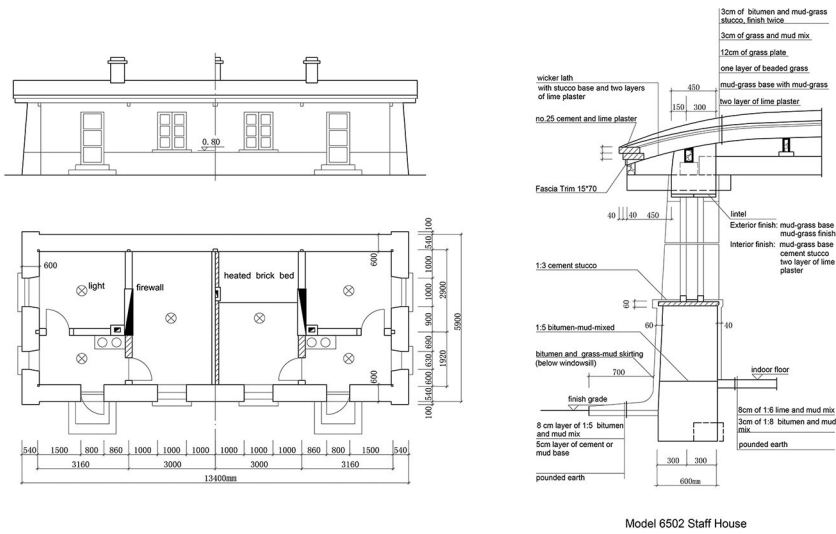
Scientific gandalei house: floor plan and height, Daqing Design Institute, 1964. Original drawing by the Daqing Design Institute, redrawn by the author.
